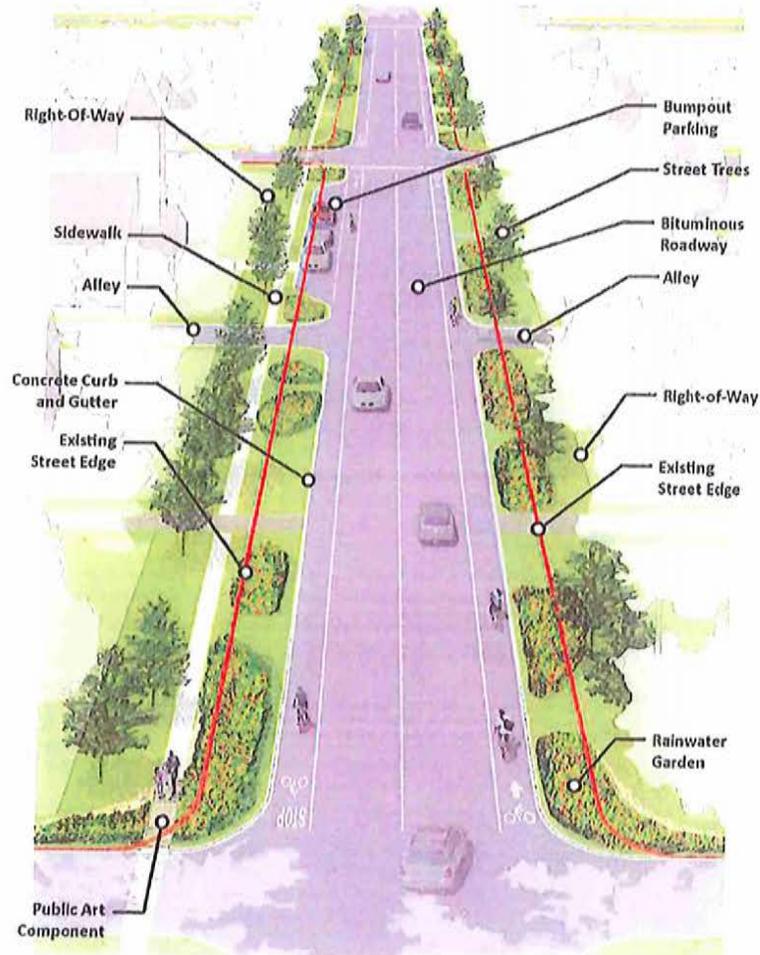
COLLECTOR STREET - RWMWD/BARR REPORT
